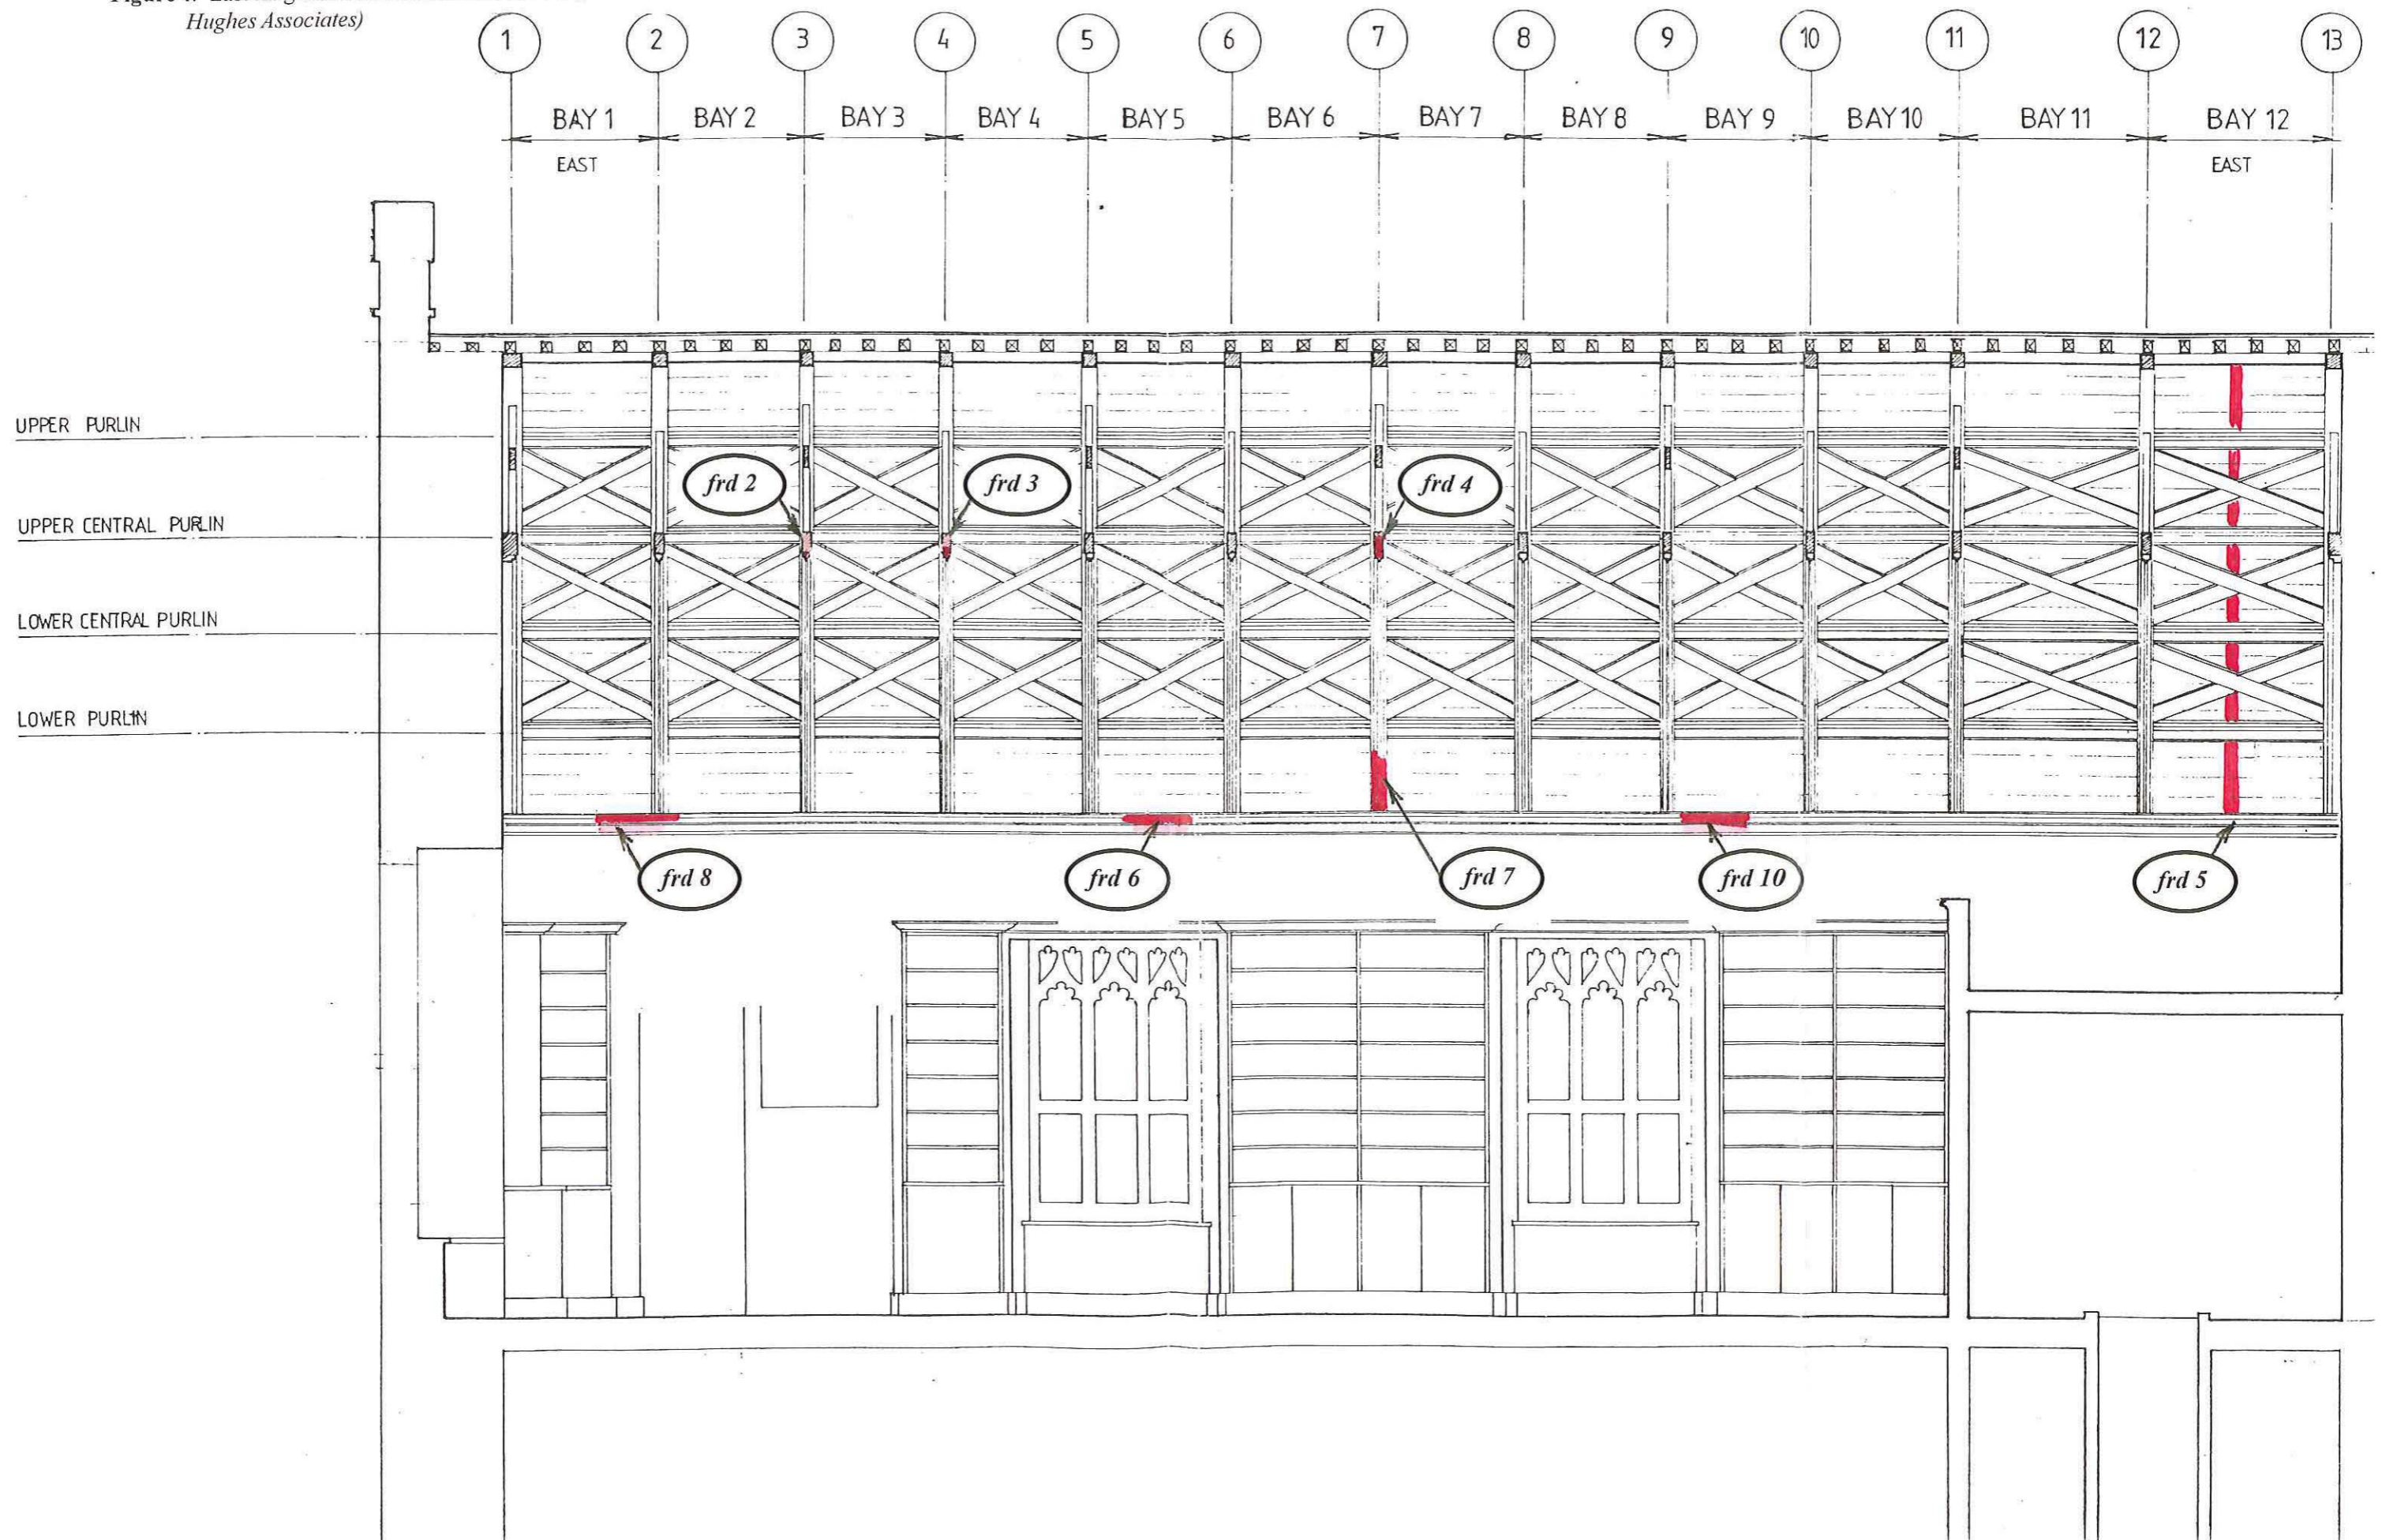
West longitudinal section of roof showing location of timbers sampled (after Philip Hughes Associates)
